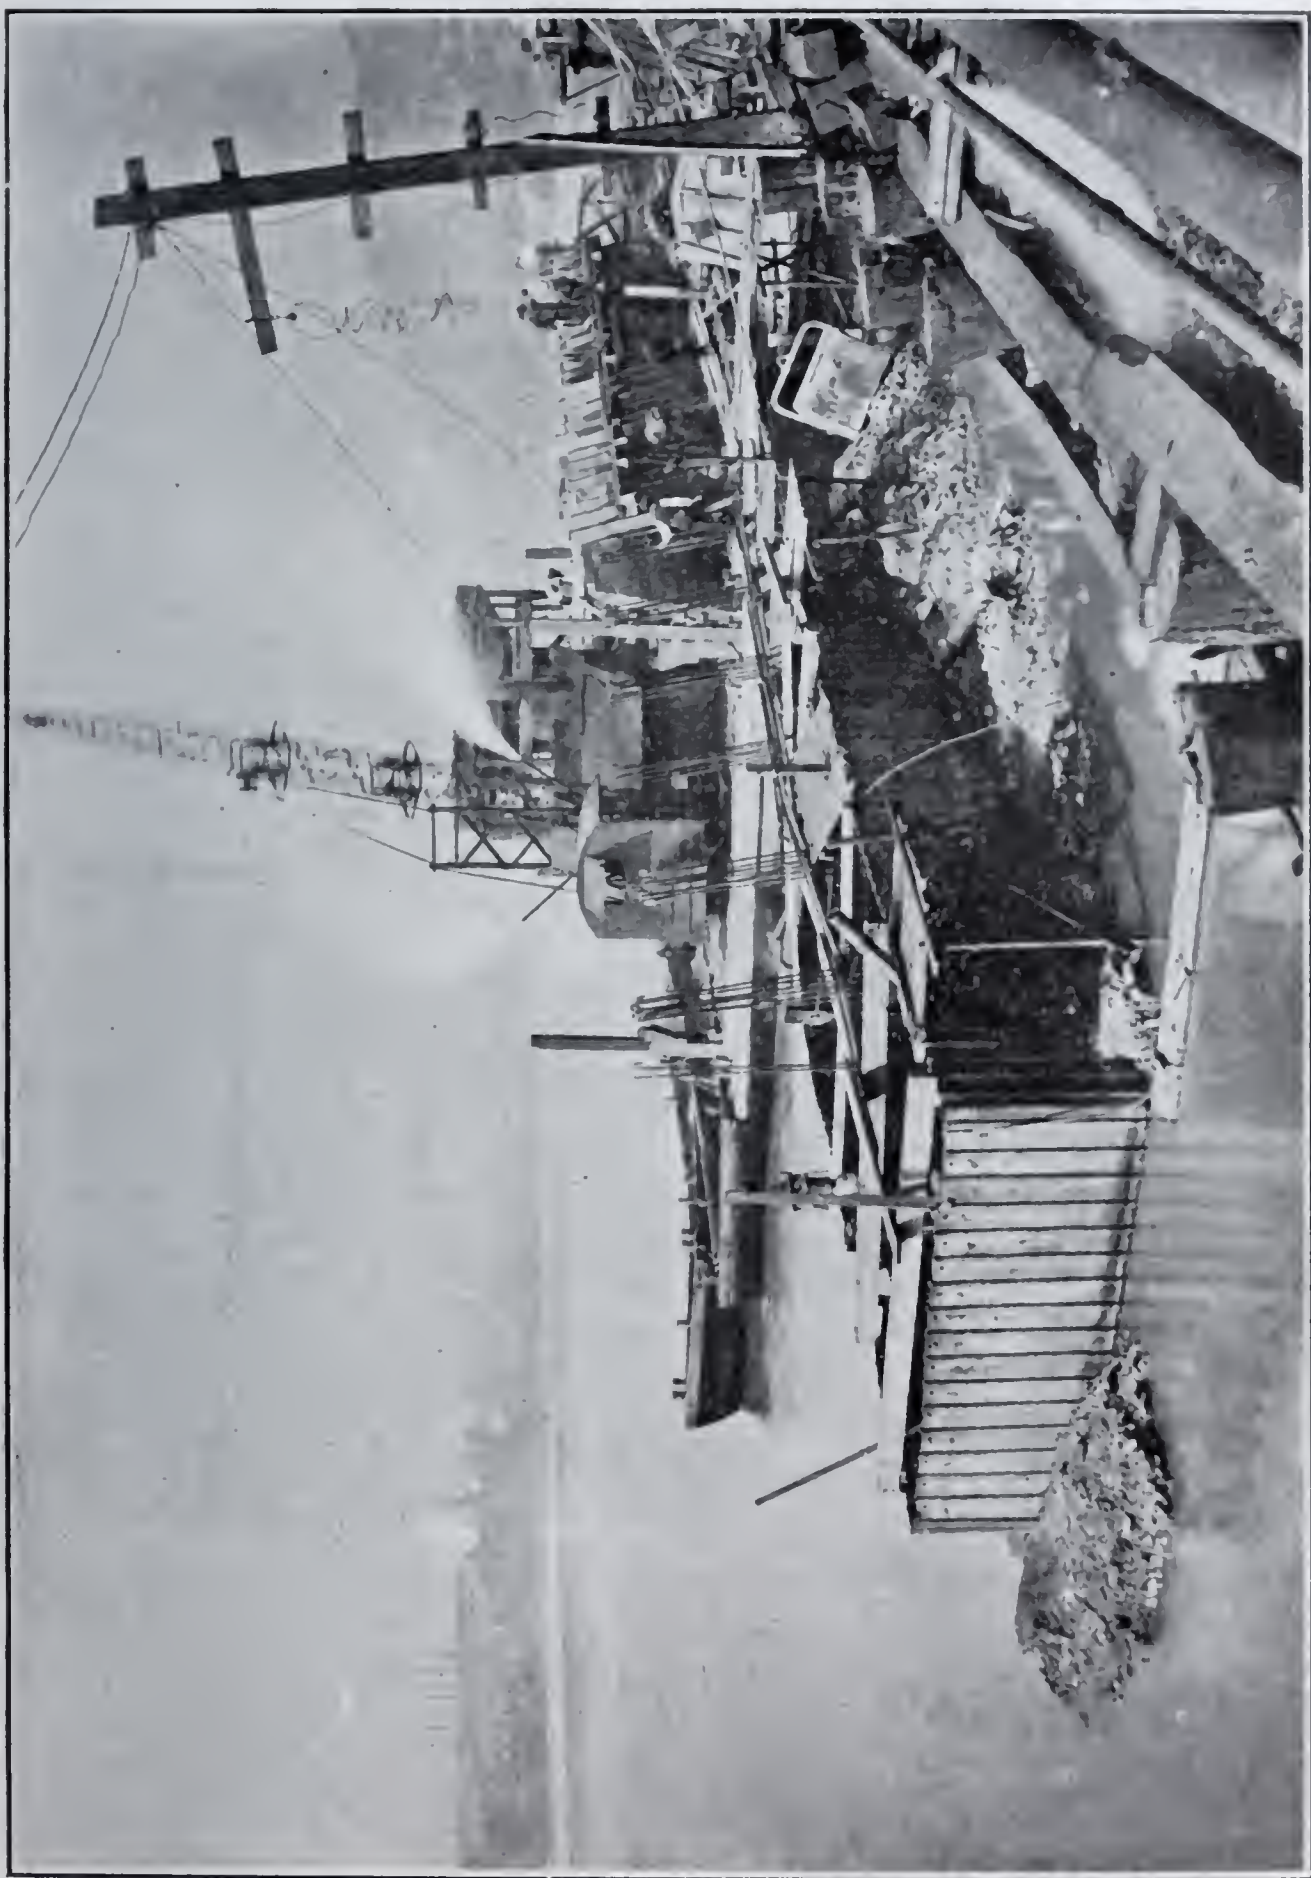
Coffor Dam for concrete river wall at National Tube Co.'s
